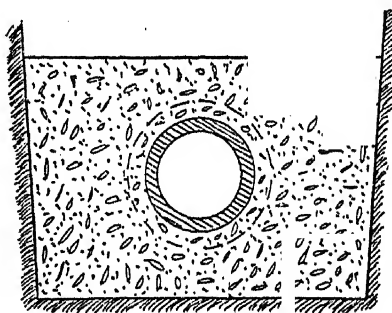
Section through a Trench, showing the Drain-pipe encased in Concrete.
